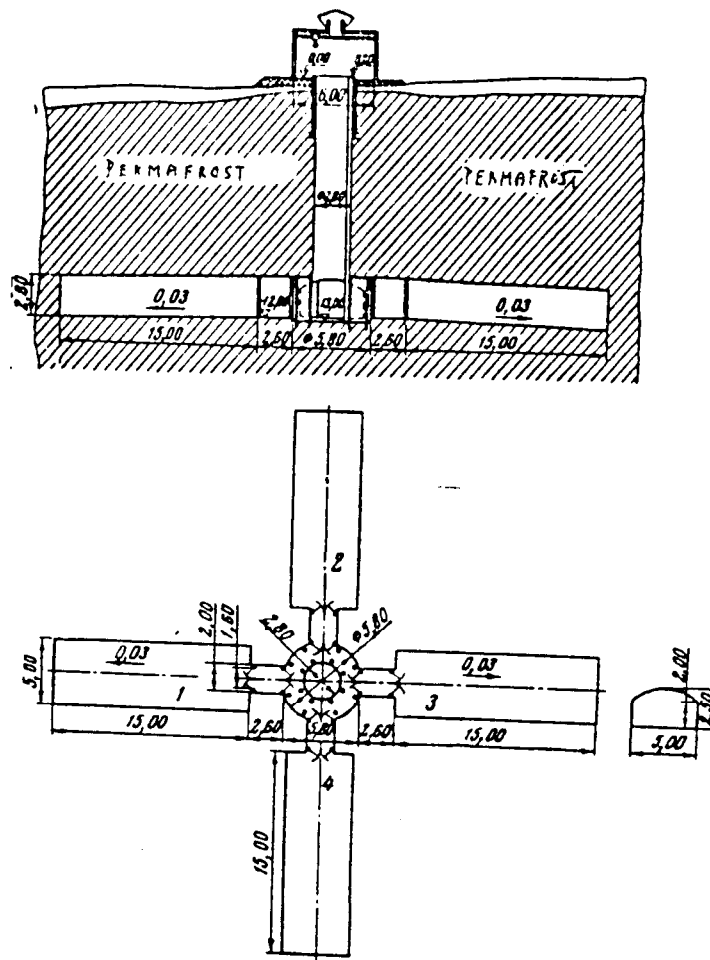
A shaft-type underground cold storage facility with the rooms arranged in the shape of a fan
